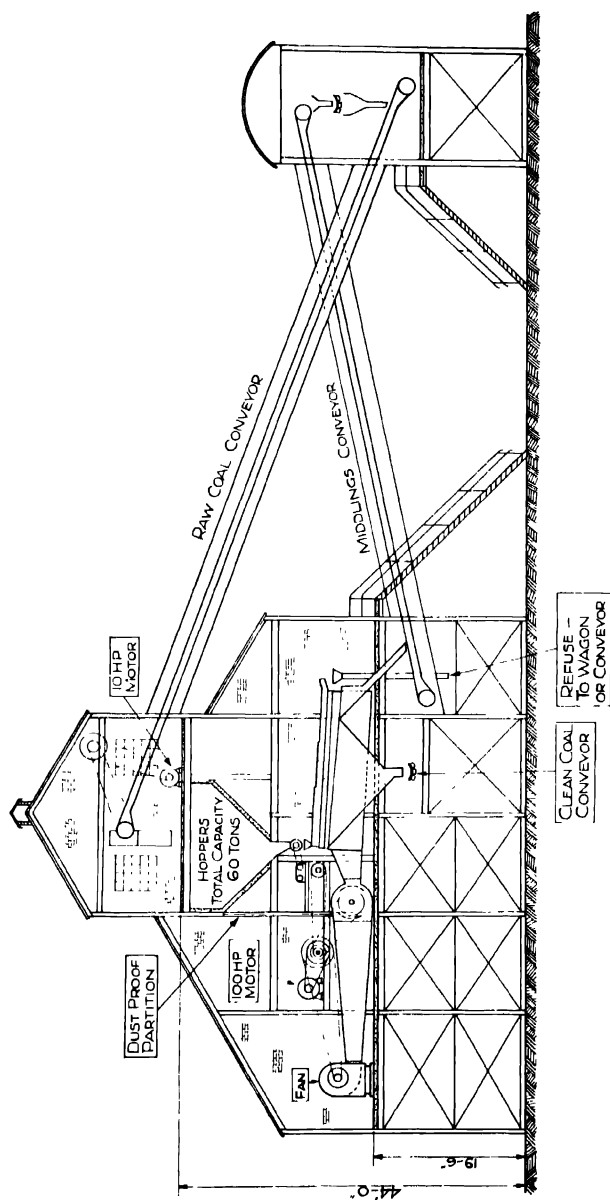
Sectional Elevation of General Standard Arrangement for a Static Dry Washer Plant of 100 tons per hour capacity.
